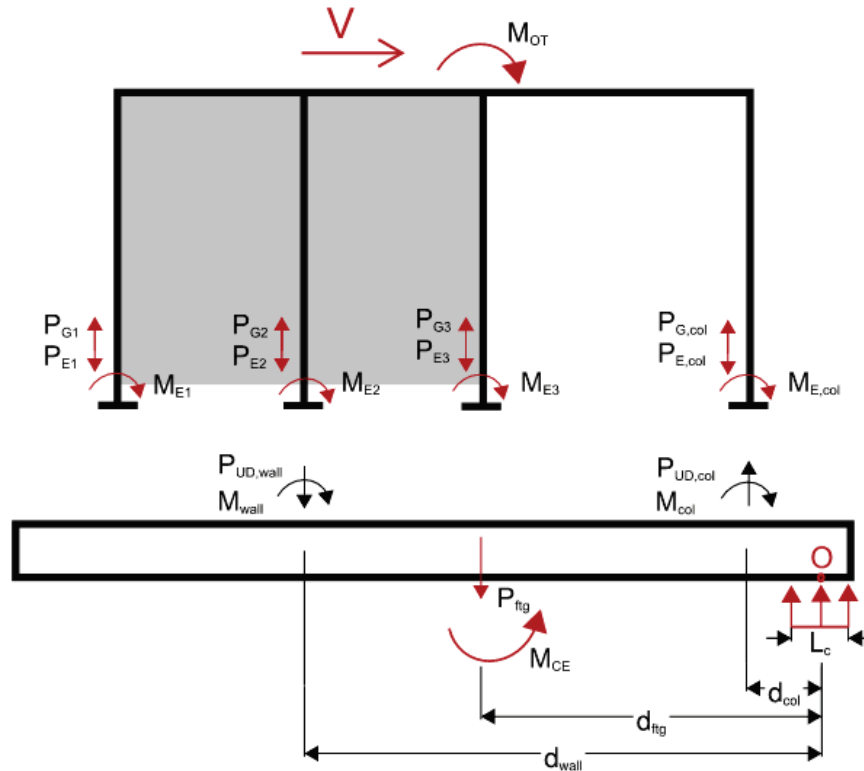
Foundation plan showing Idealized proposed rectangular foundation at corner wall.
